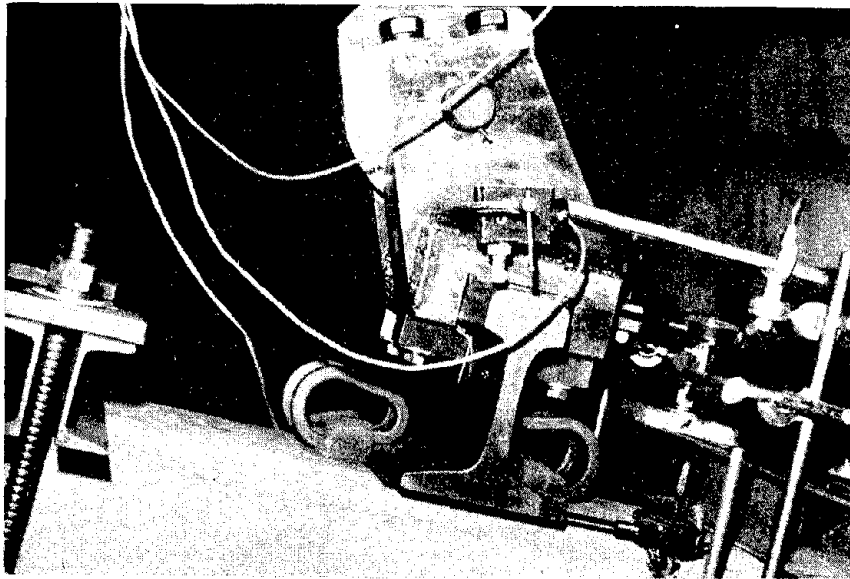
RAIL FASTENING REPEATED LOAD TEST
